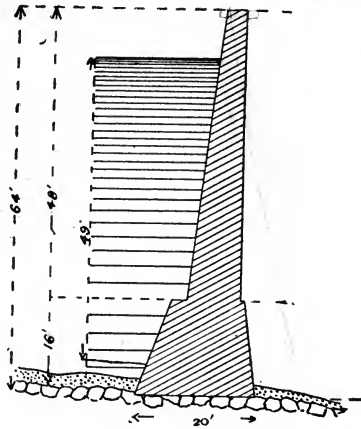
CROSS-SECTION OF BEAR VALLEY DAM.
